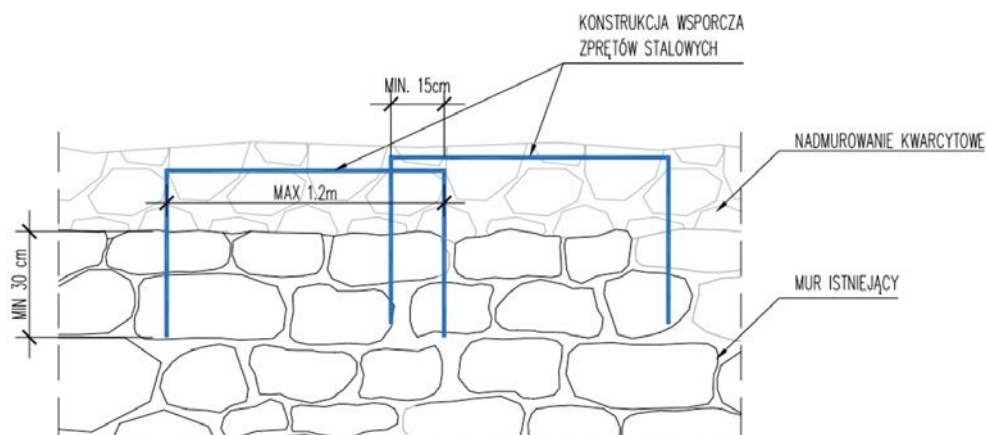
Diagram of wall repairs beneath the crest. Installation of steel bars within the wall structure following strengthening injection.
